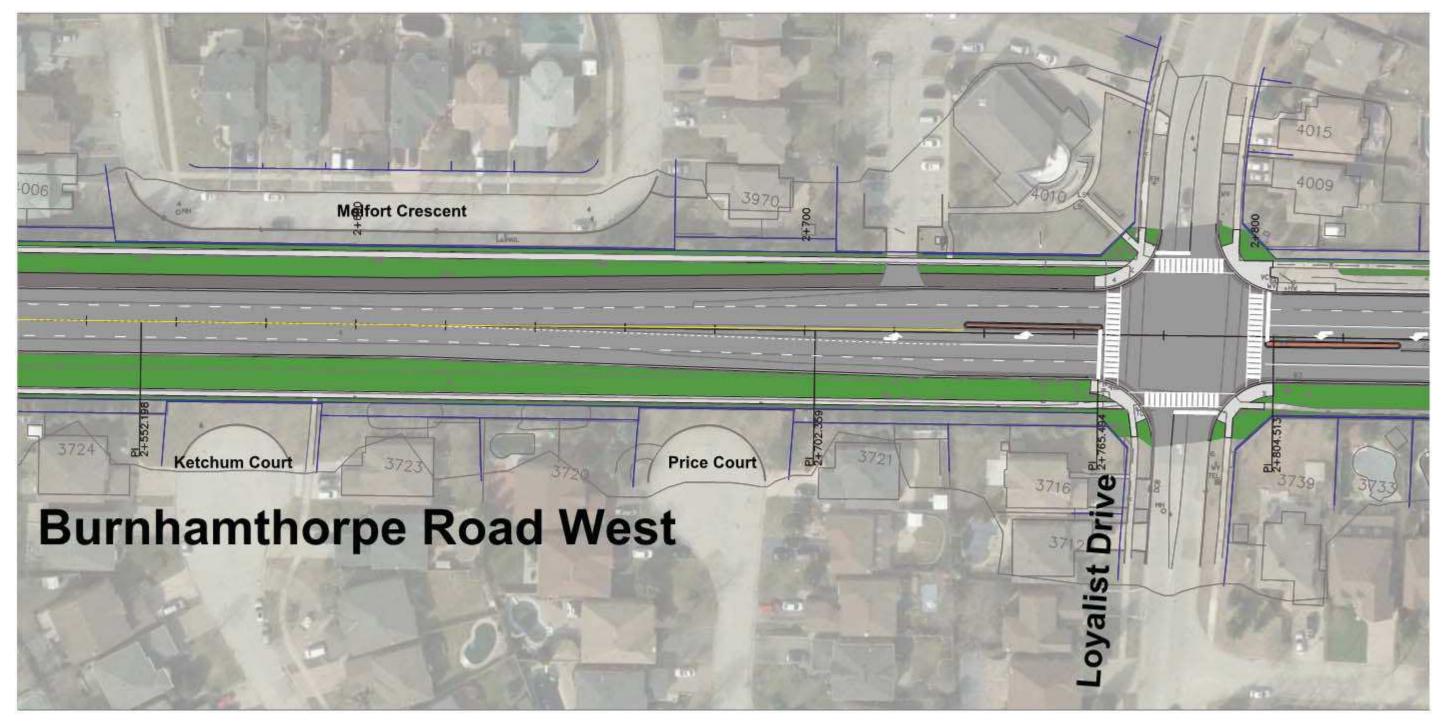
Alternative Design Concept #2 - Widen Burnhamthorpe Road West to 4 Lanes (No In-Boulevard Parking on the South Side)
